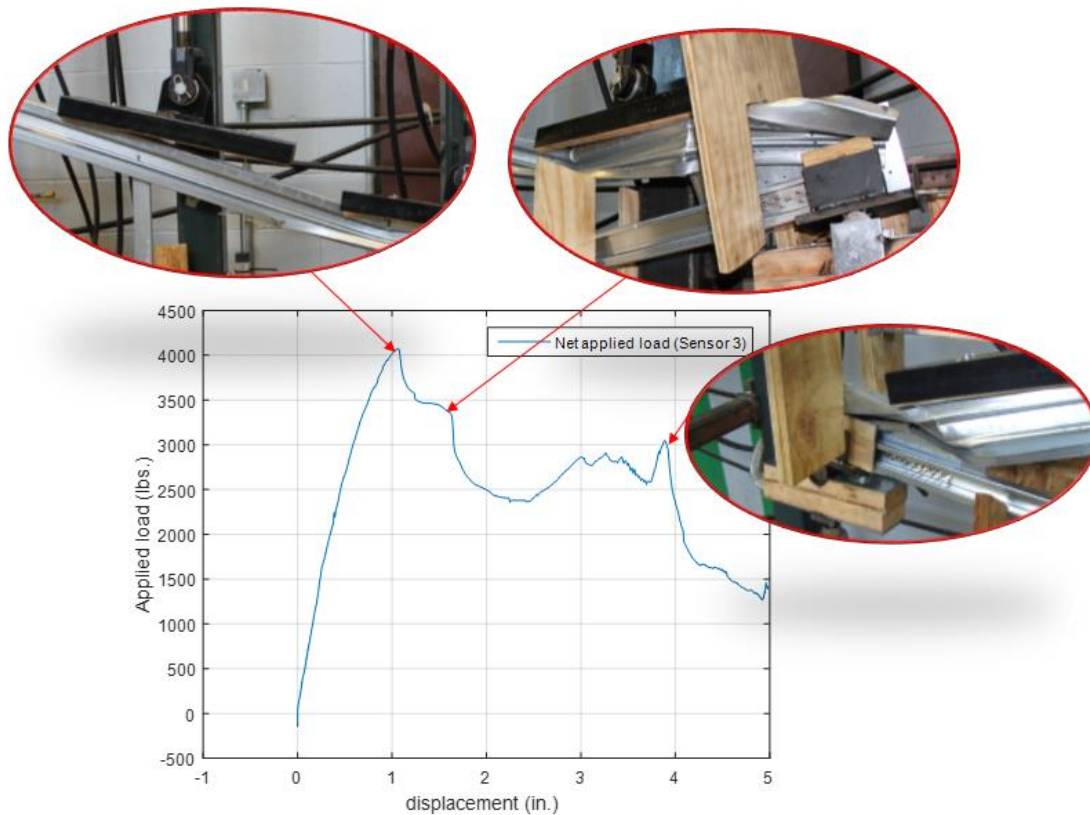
TrusSteel Testing summary of midpoint displacement sensors with failure pictures at peak loads (TrusSteel Test #5)
